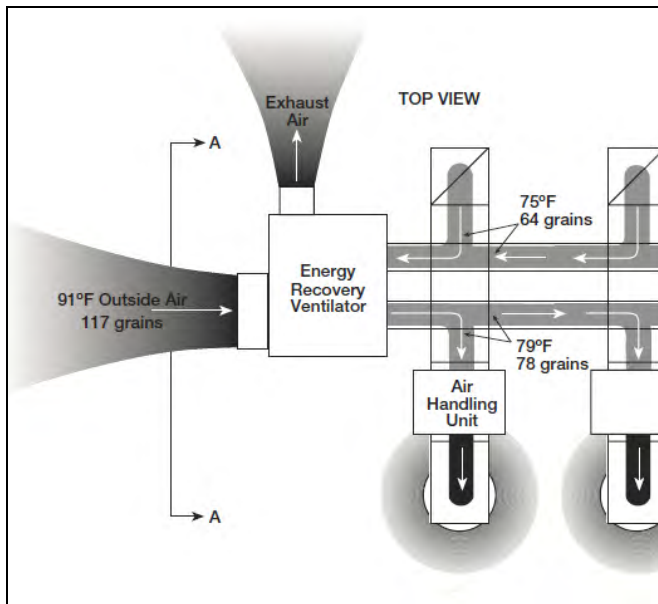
Plan view of a single rooftop Energy Recovery Ventilator (ERV) serving multiple air handling units located on each floor within the NRDC building
